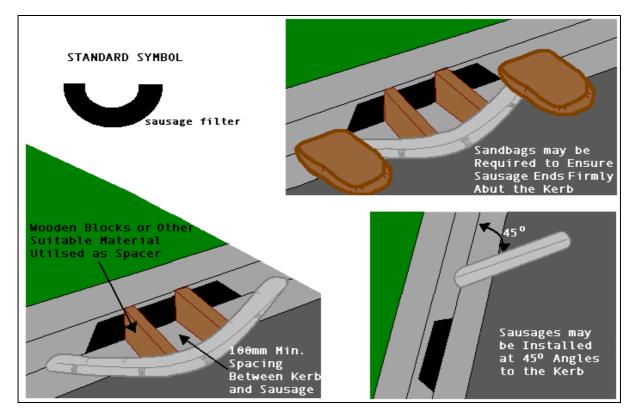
Gravel Sausage (Figures from VSAP Building Construction Sites Project Group, 2003)
